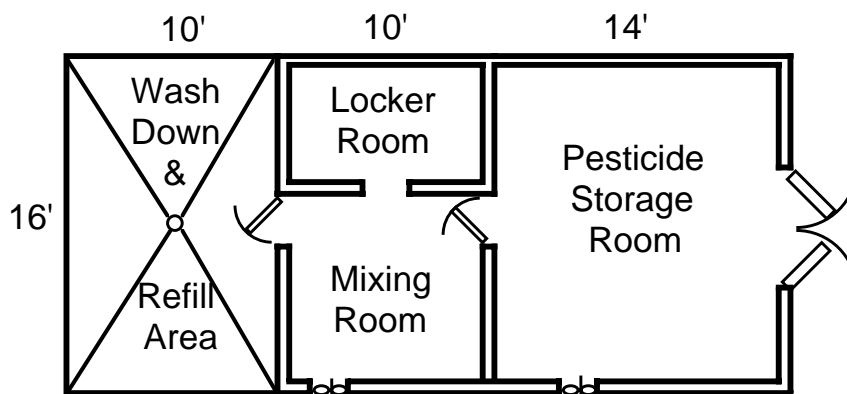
Plan view of a 16' x 24' pesticide storage building.
